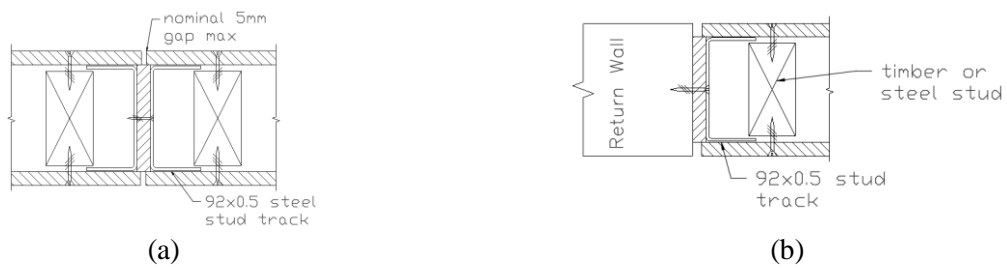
Details of modifications to Tasligedik *et al.* (2015) low damage system (a) intermediate joint detail for Specimen 2 (b) Studs fit within steel tracks at junction for both specimens.
